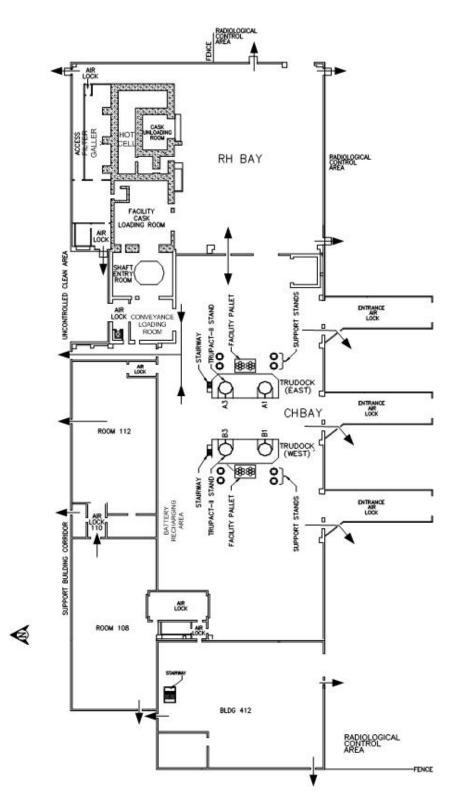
D-7 Evacuation Routes in the Waste Handling Building
